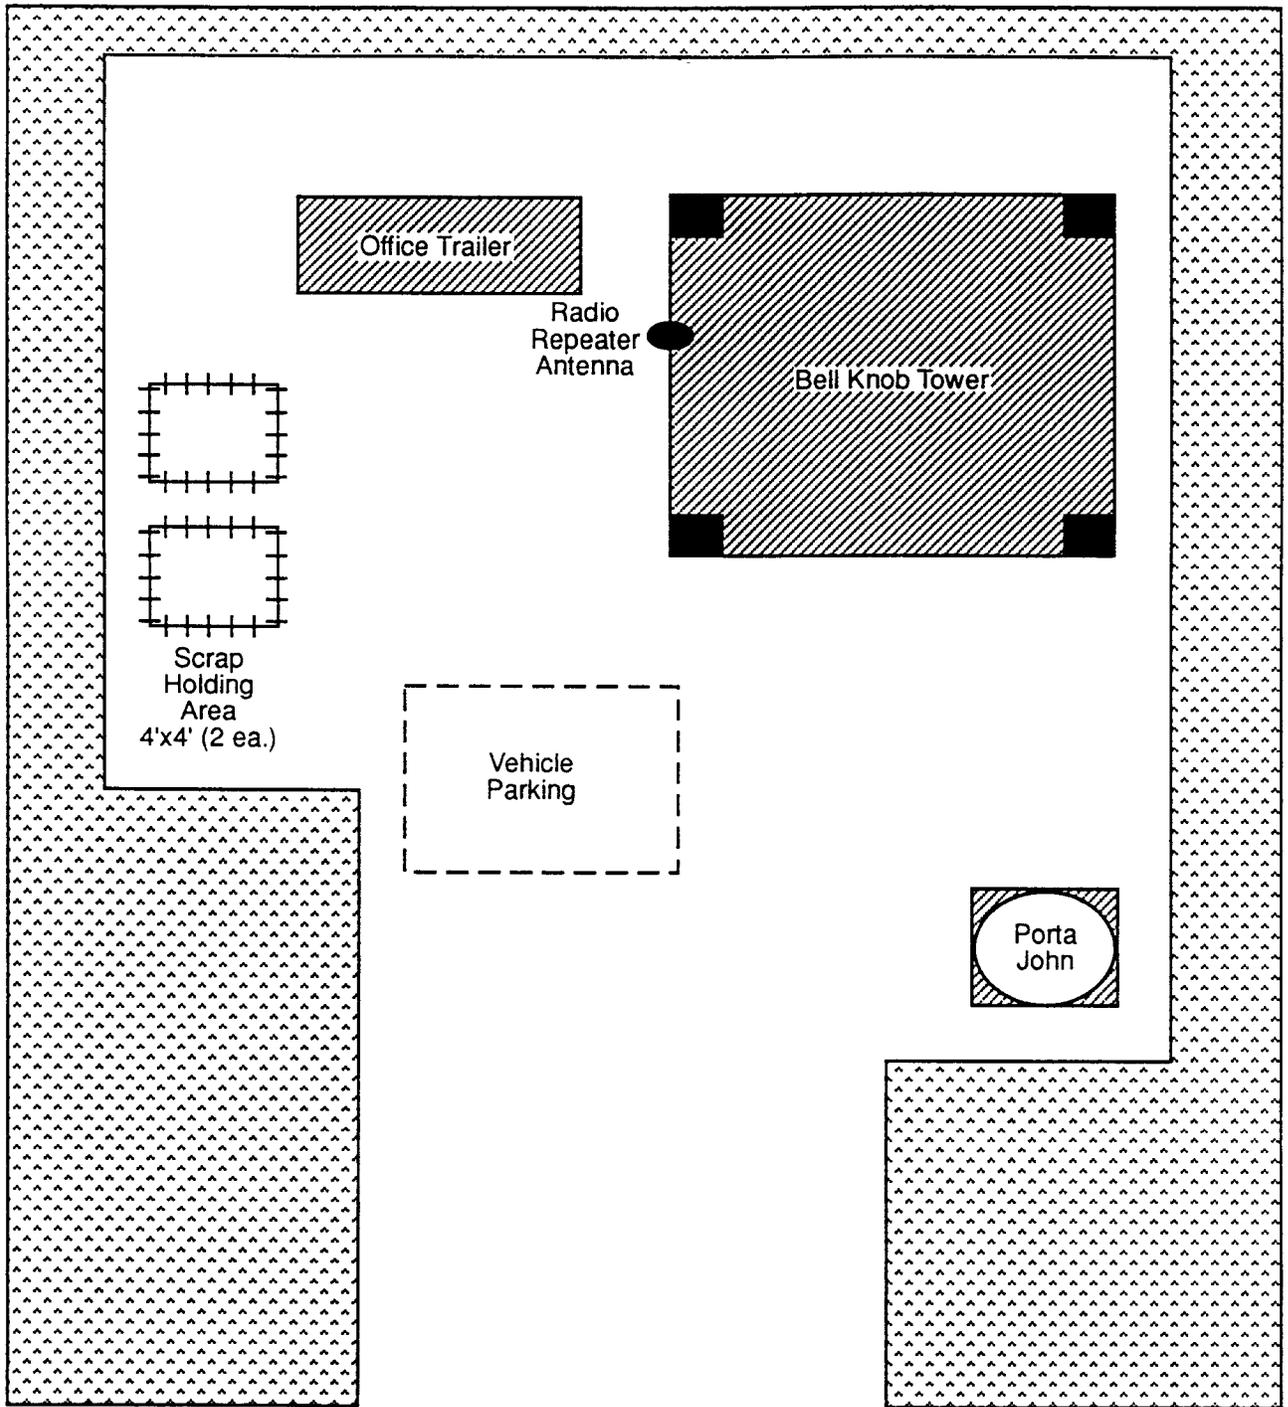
PROPOSED BELL KNOB TOWER BASE CAMP
